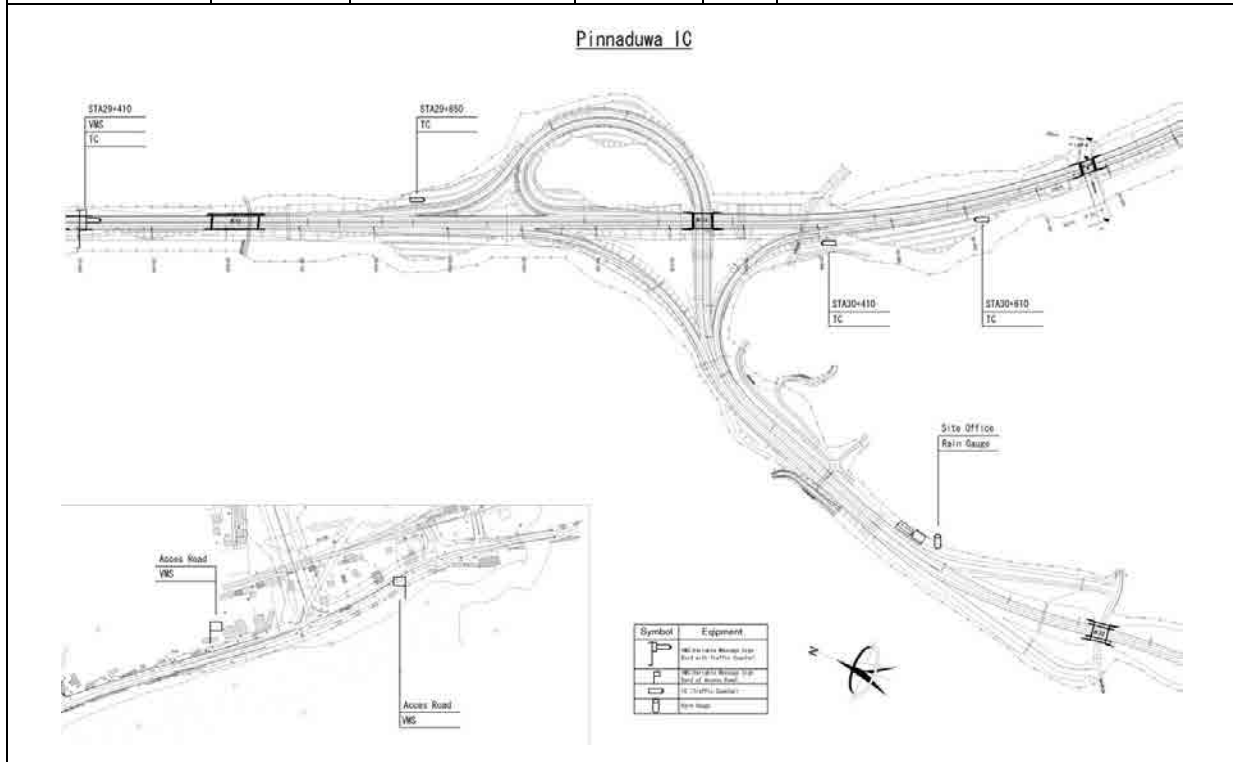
Road side equipment layout plan (Pinnaduwa IC)
